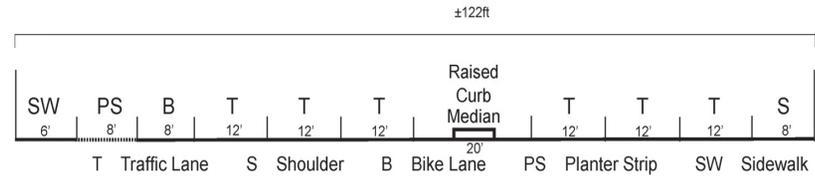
ALTERNATIVE A AND ALTERNATIVE C BETWEEN FAIRGROUNDS ROAD AND TUSSEY LANE
